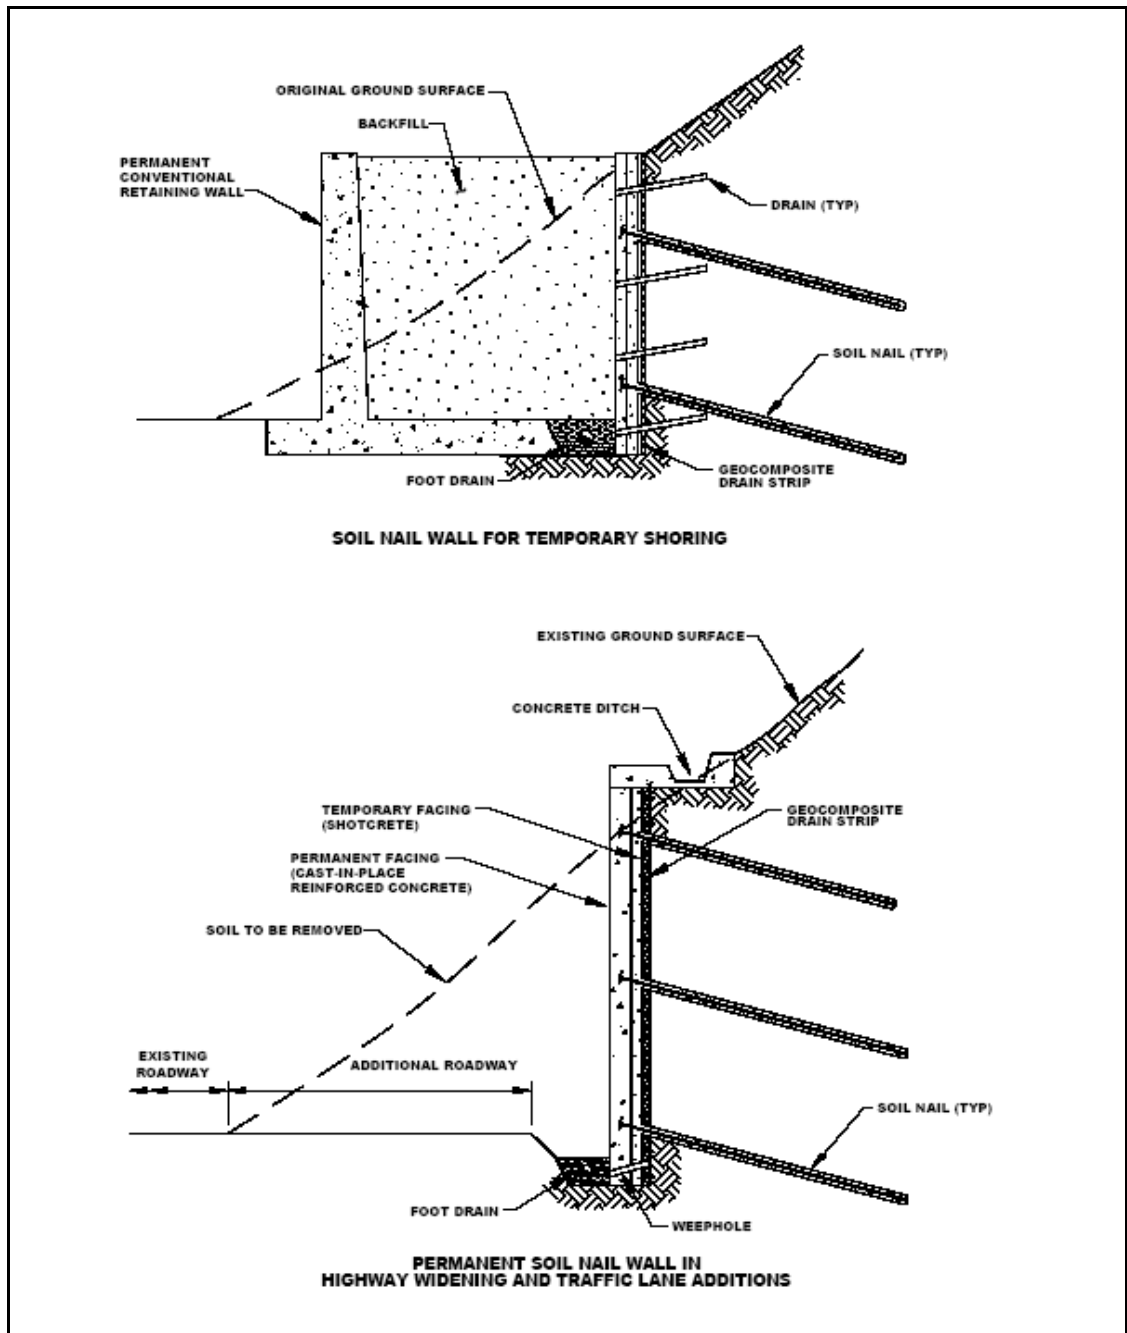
Soil nail walls for temporary and permanent cut slopes (FHWA, 2003)
